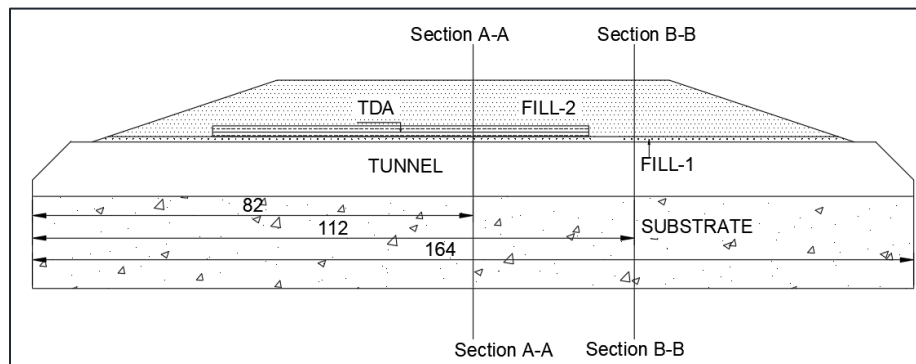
Tunnel Longitudinal Profile and Calculation Section Location
